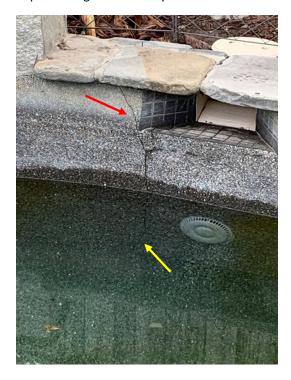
The pool was cracked in the shallow end. The crack extended several feet down the wall.
